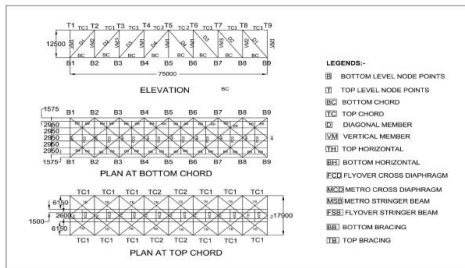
DIMENSIONS OF MEMBERS DRAWINGS
